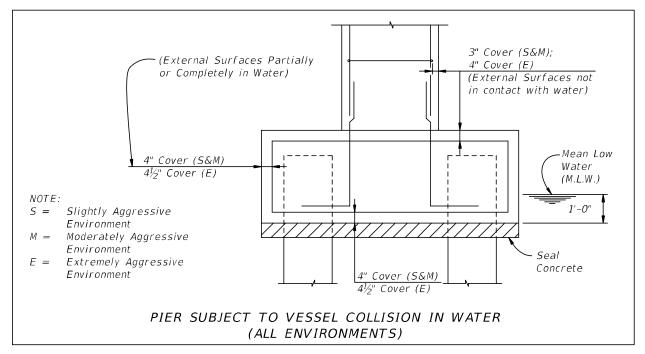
Piers (All Environments) (3 of 3)
